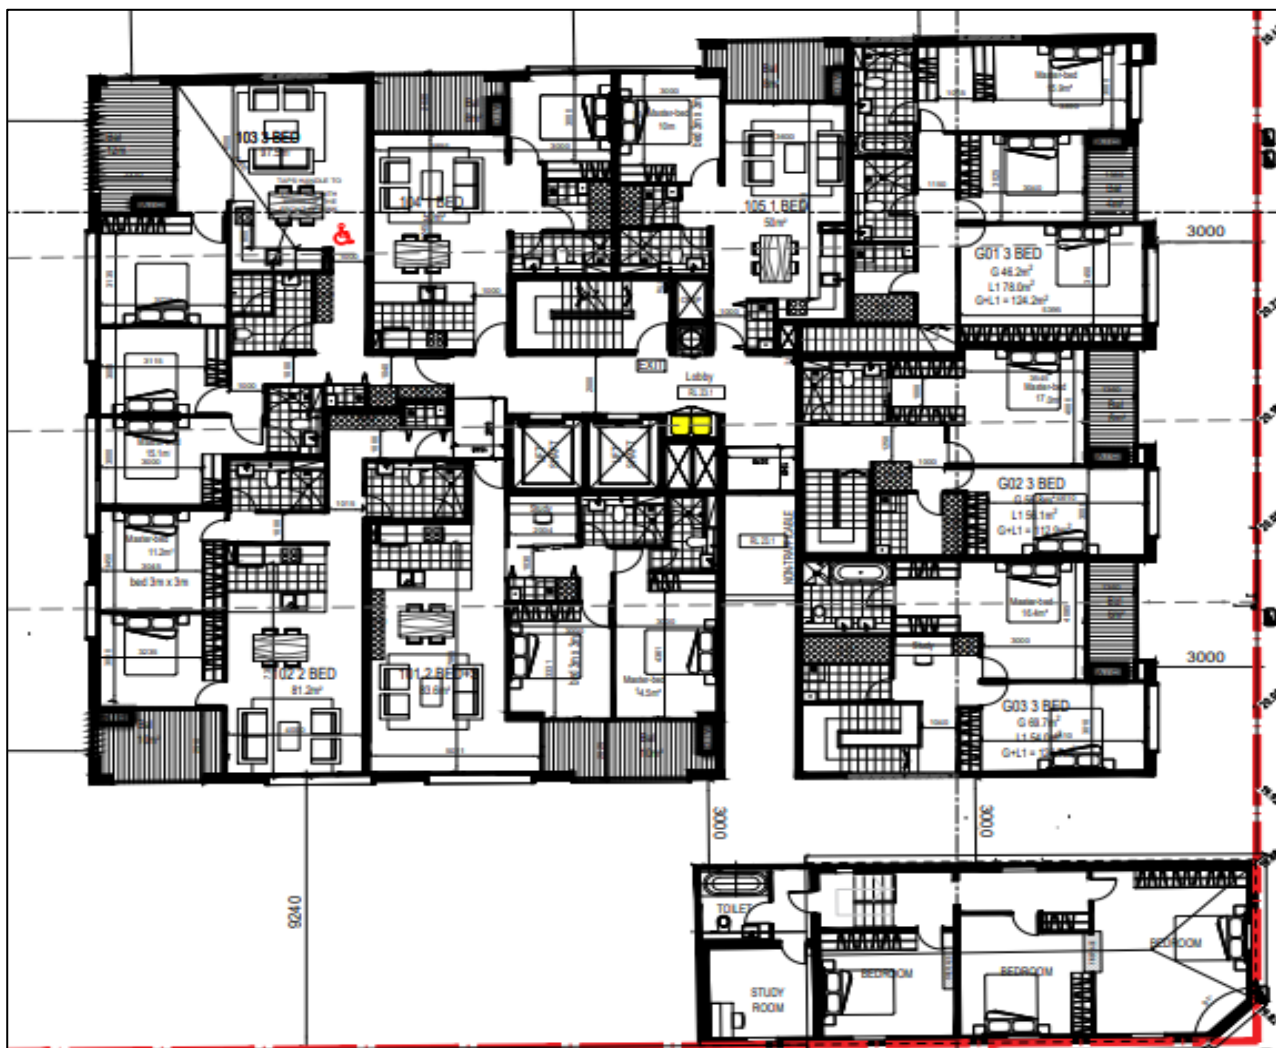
Extract of applicants submitted Level 1 Floor Plan.
